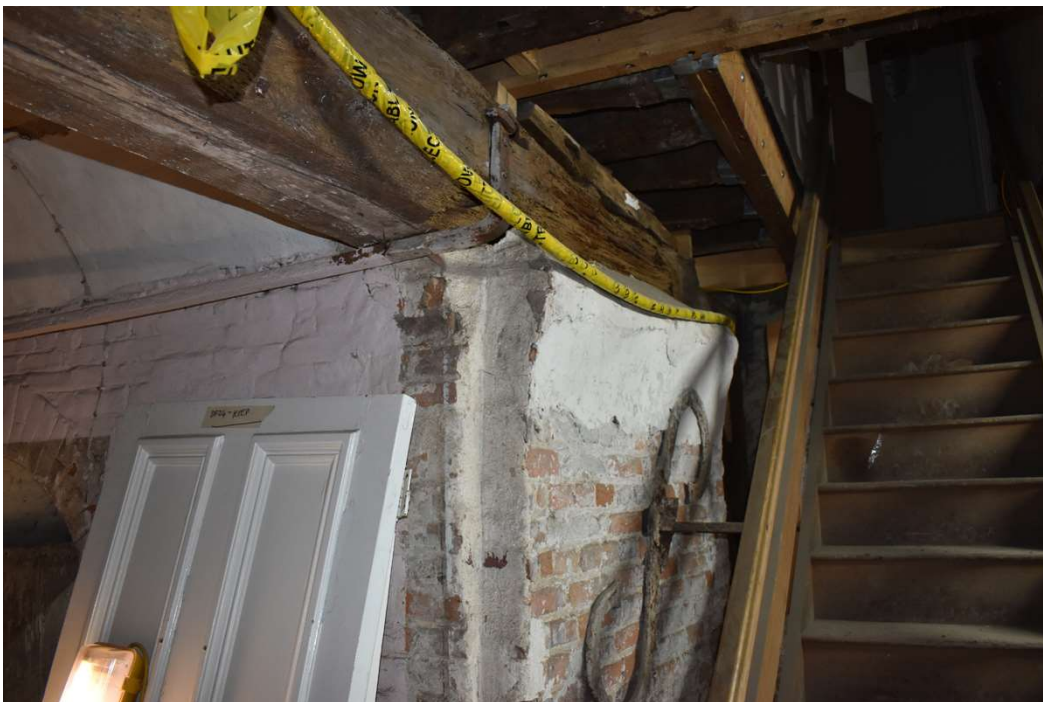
Brick arch in bay 5. Blocked northern archway visible. Looking northeast.
